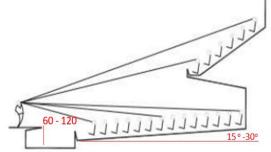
Elevation of Stage Area (Source: Long, 2006)
